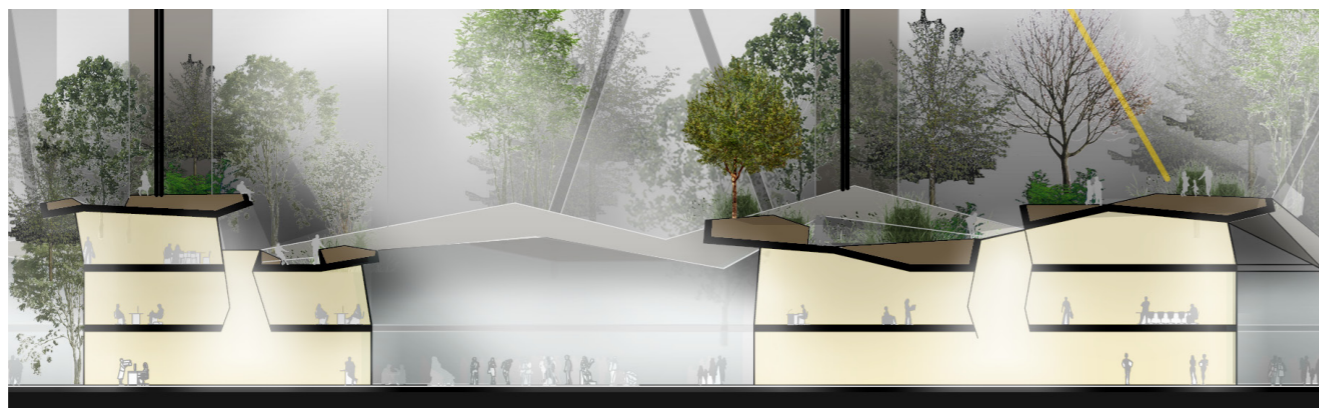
groundfloor | N-S section of the landscape. see also picture 3.4.1
